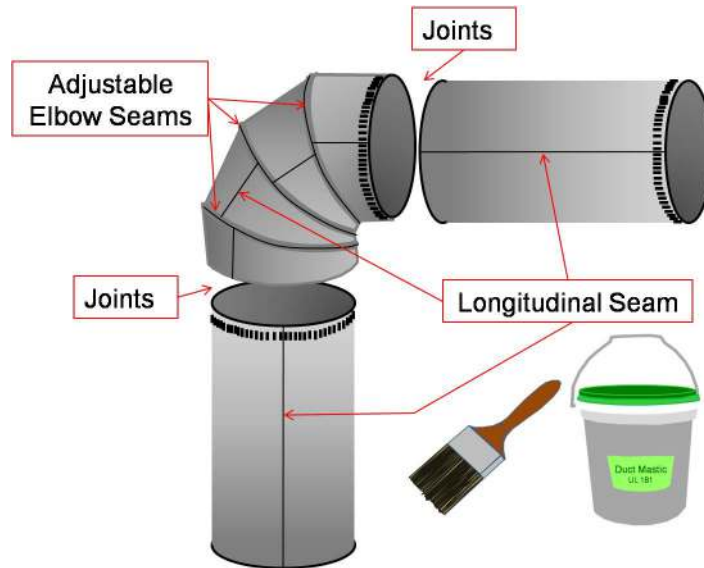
Seal all joints and seams in the metal ductwork with mastic, including all joints and seams in elbows, before installing insulation.
